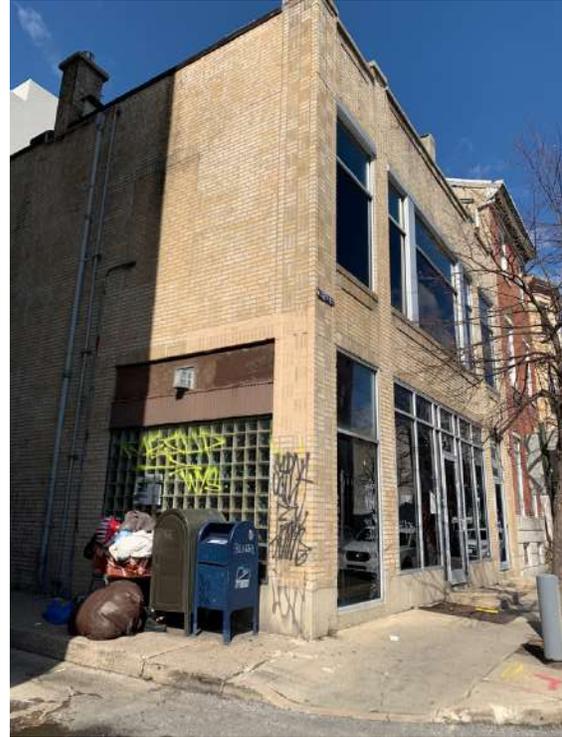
Corner detail of east (12<sup>th</sup> Street) and south (Spring Street) elevations
